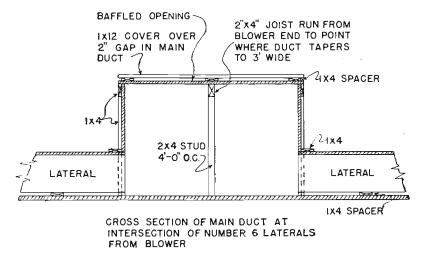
Section view of main duct on a lateral-duct system, showing top baffled openings and construction details.
